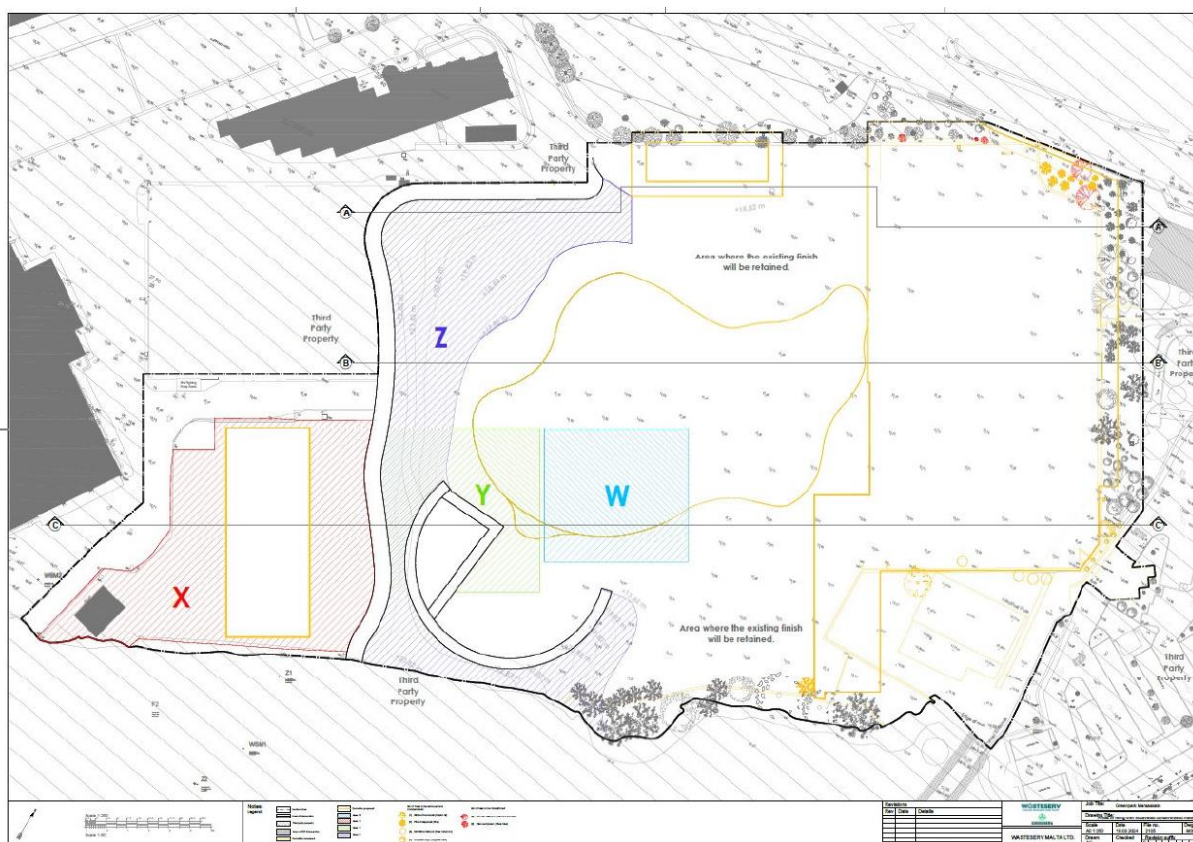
Plan showing the location of excavated material to be re-used on site (Source: PDS)
